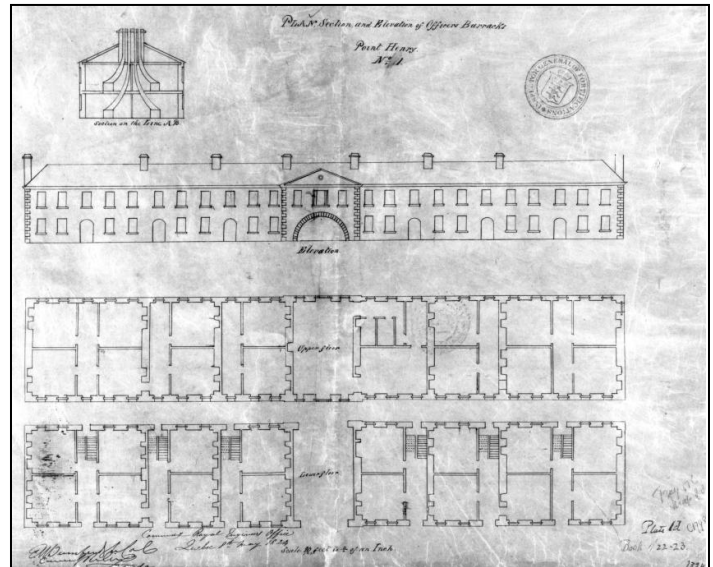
Plan of the 1812 Fort Henry Officers' Barracks.
